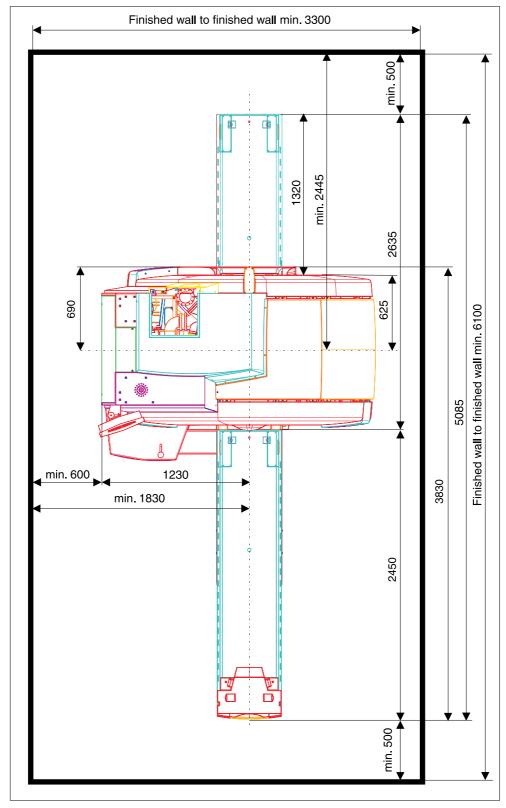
Examination room; minimum technical room size from finished wall to finished wall
